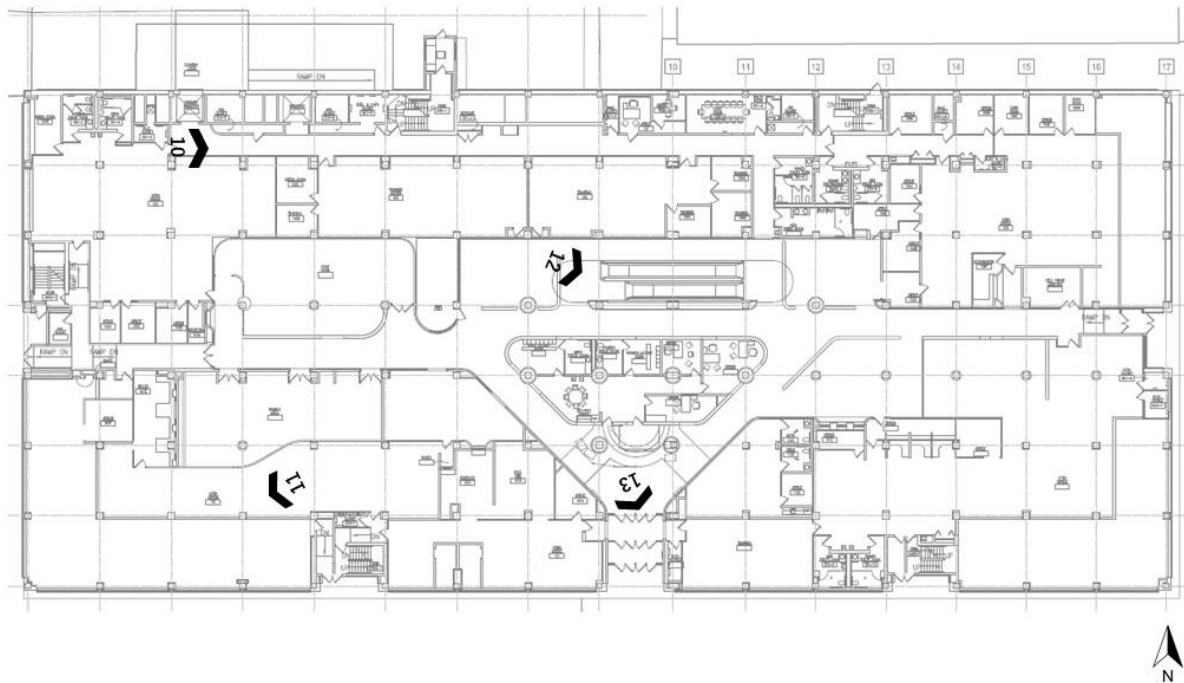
Photo Map, First Floor, Photos 10 to 13.
